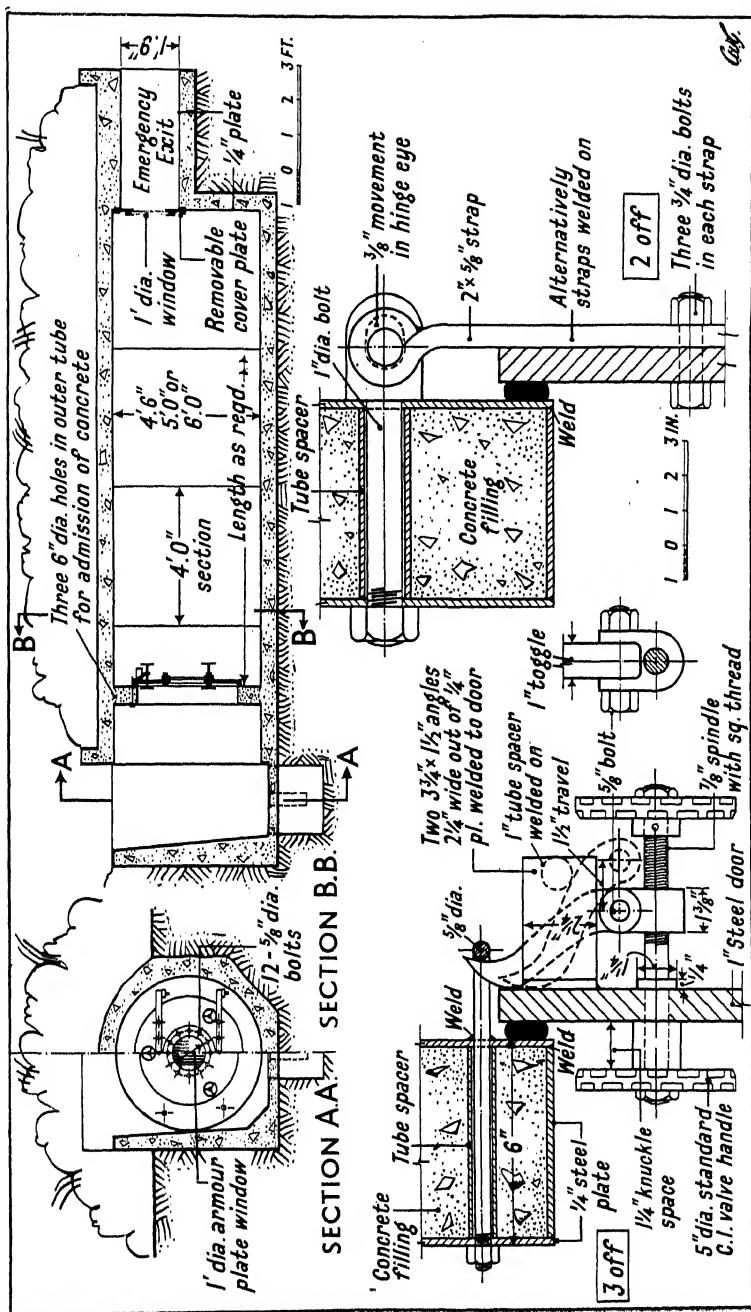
The steel tubular shelter with blast-proof splinter-resisting and gas- and water-tight door. (Note blast-proof windows and emergency exit.)
